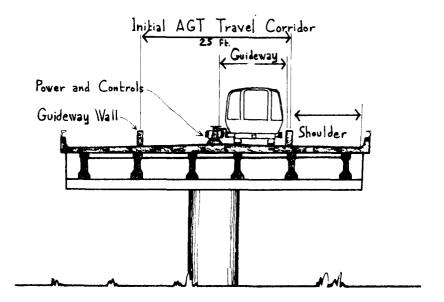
Cross-section of Guideway, Evolutionary Path #1
